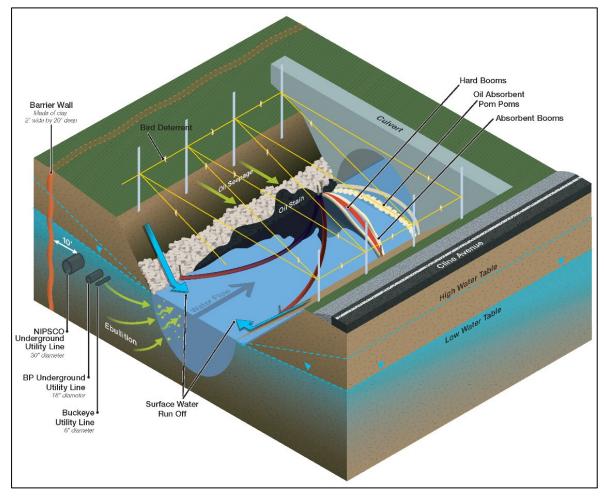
Alternative 4 – Barrier Wall with Continuing Current Approach – Conceptual Sketch
